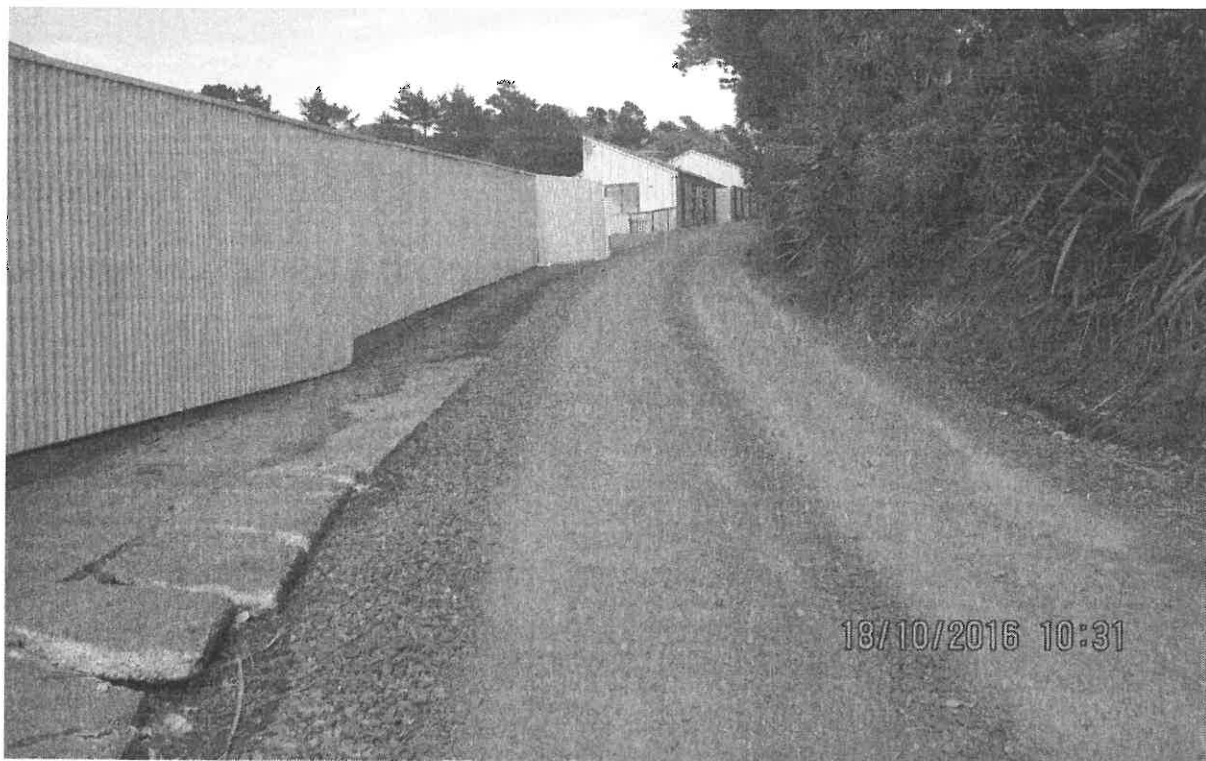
Commencement of the gravel section of Lyders Road. The fence belongs to 107 Cliffs Road. The house in the upper centre is 105 Cliffs Road.
